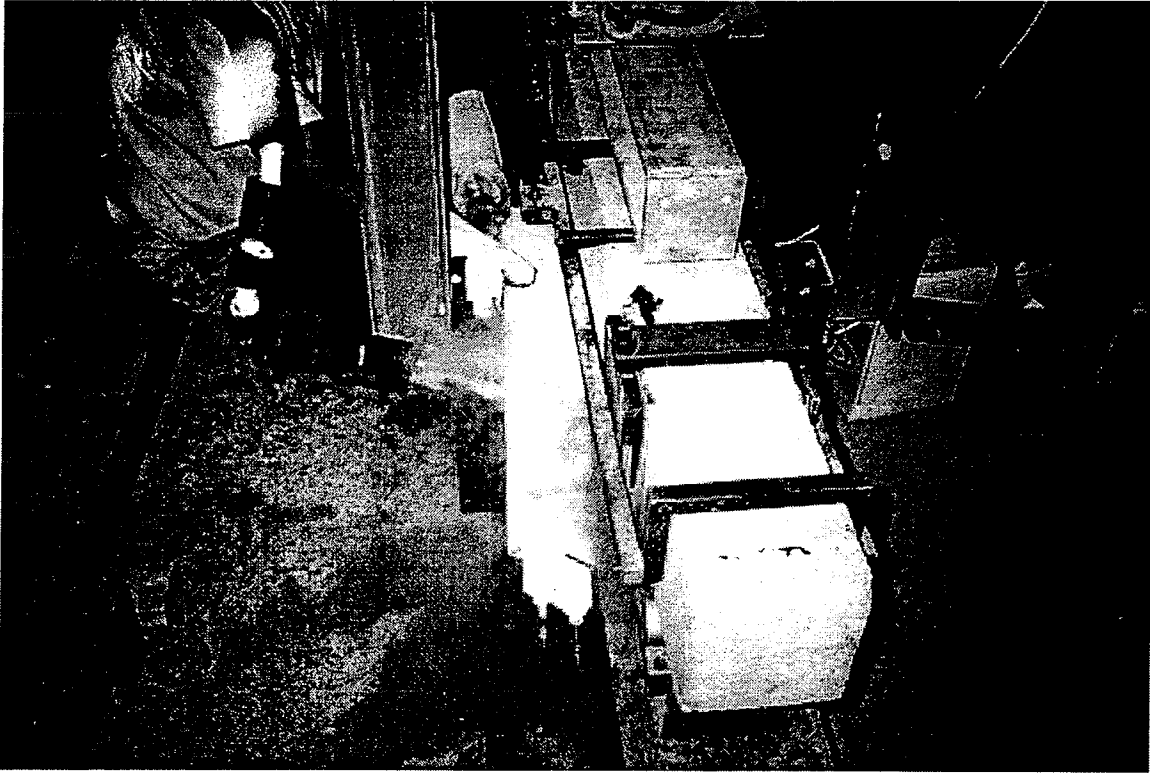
Loading of Unstrengthened Beam to Failure
